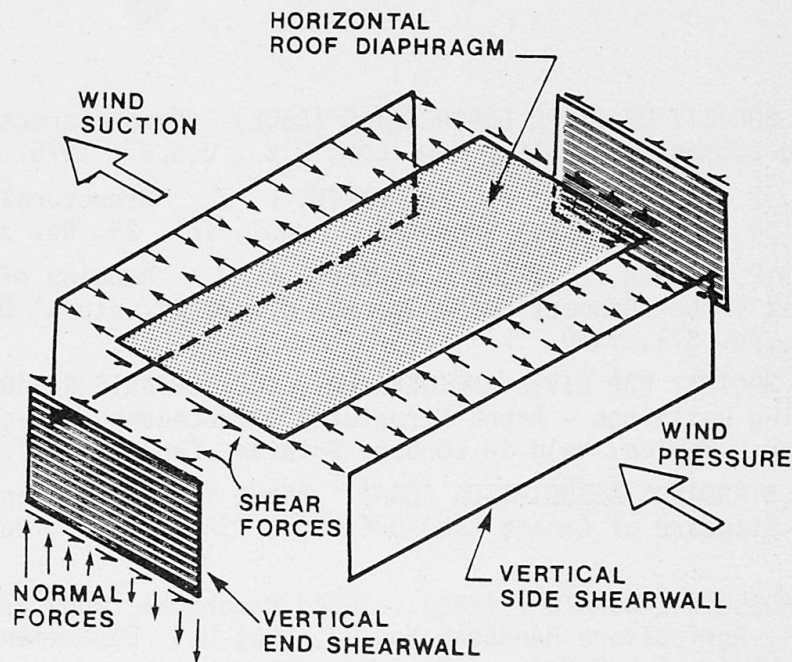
Shearwall and Diaphragm Action in a Simple Building Subjected to Wind Load
